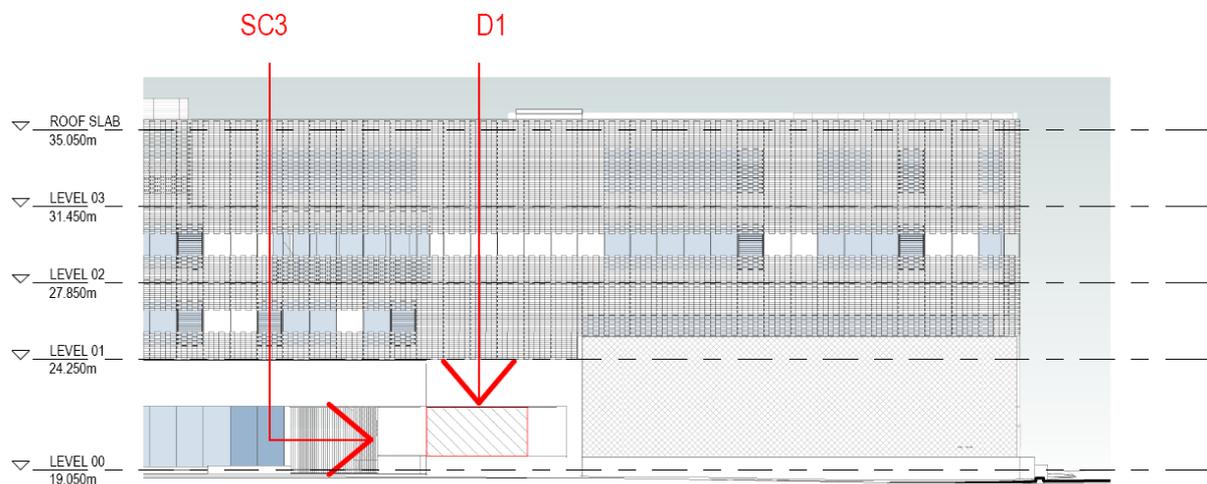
| North Elevation showing location of proposed LED sign (Source: BVN)
